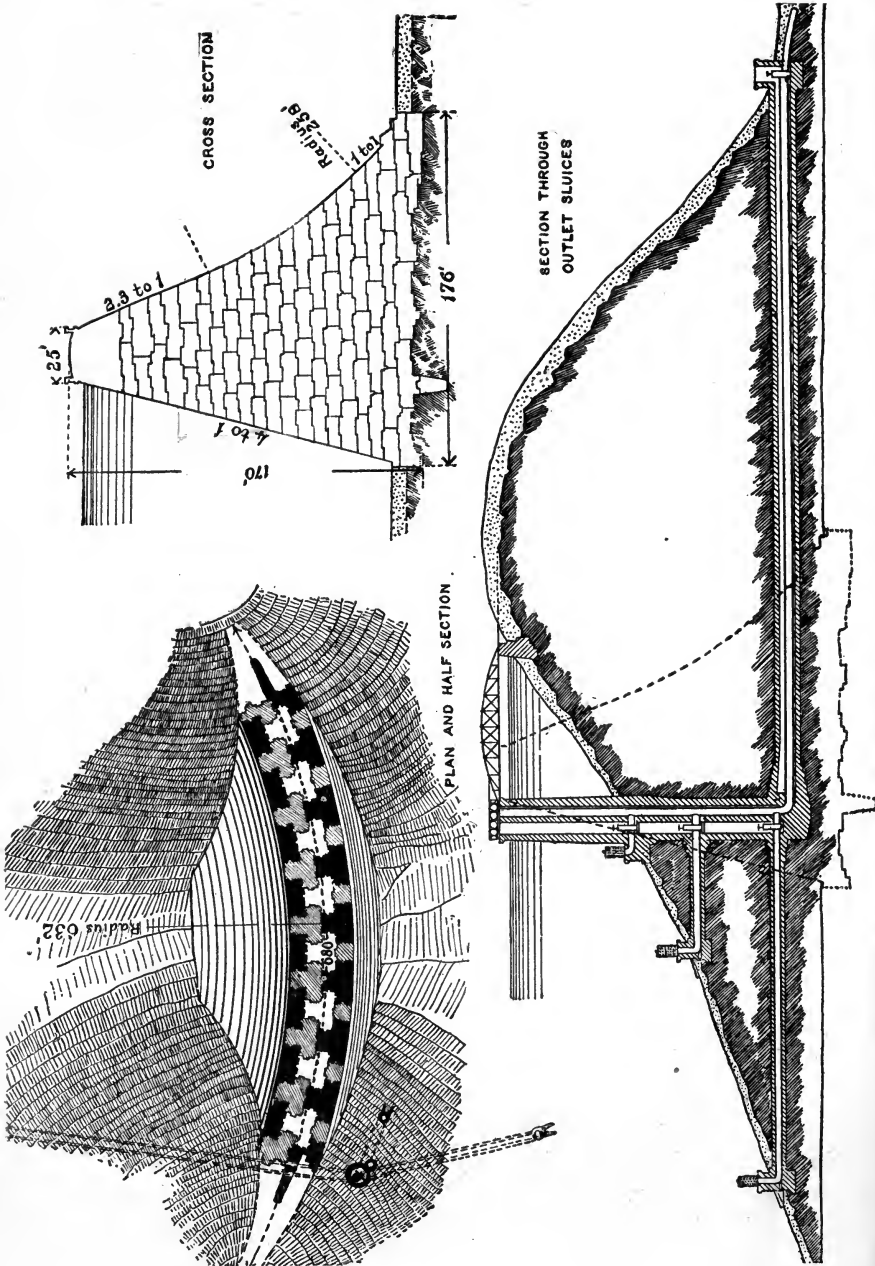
PLATE XXIII.—SAN MATEO DAM. PLAN, CROSS-SECTION AND OUTLET SLUICES.
